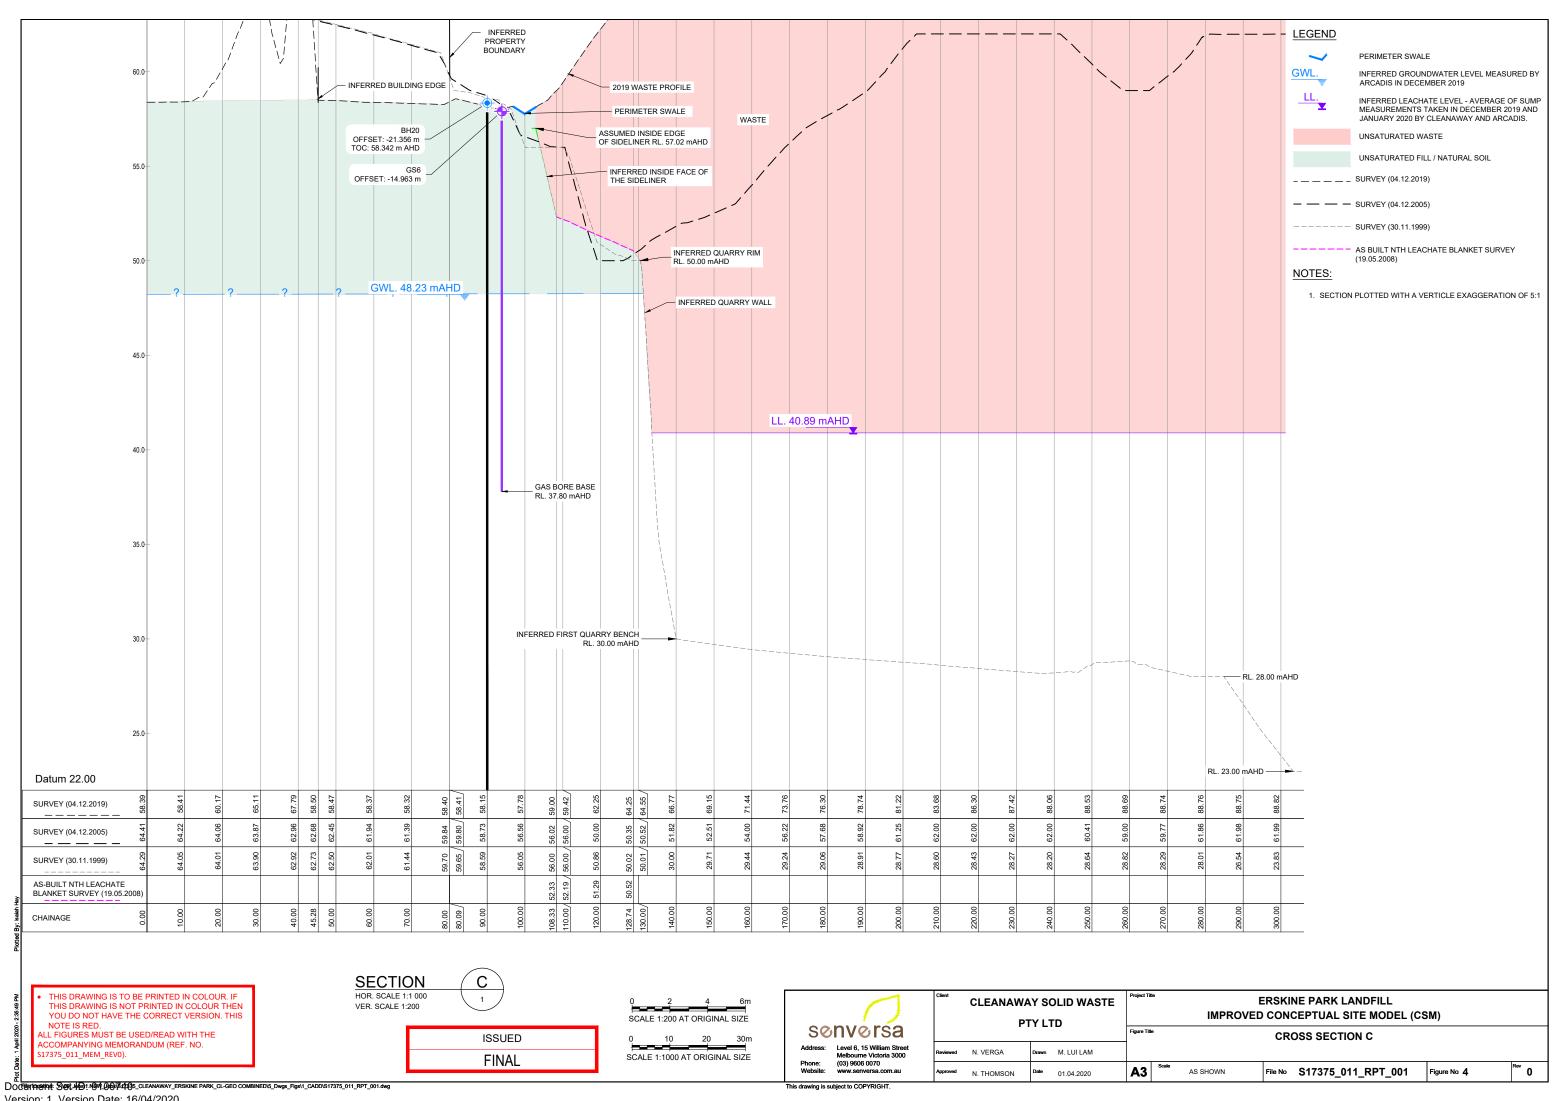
to 21: General Layout Plan & Cross-sections A to H and J to U
